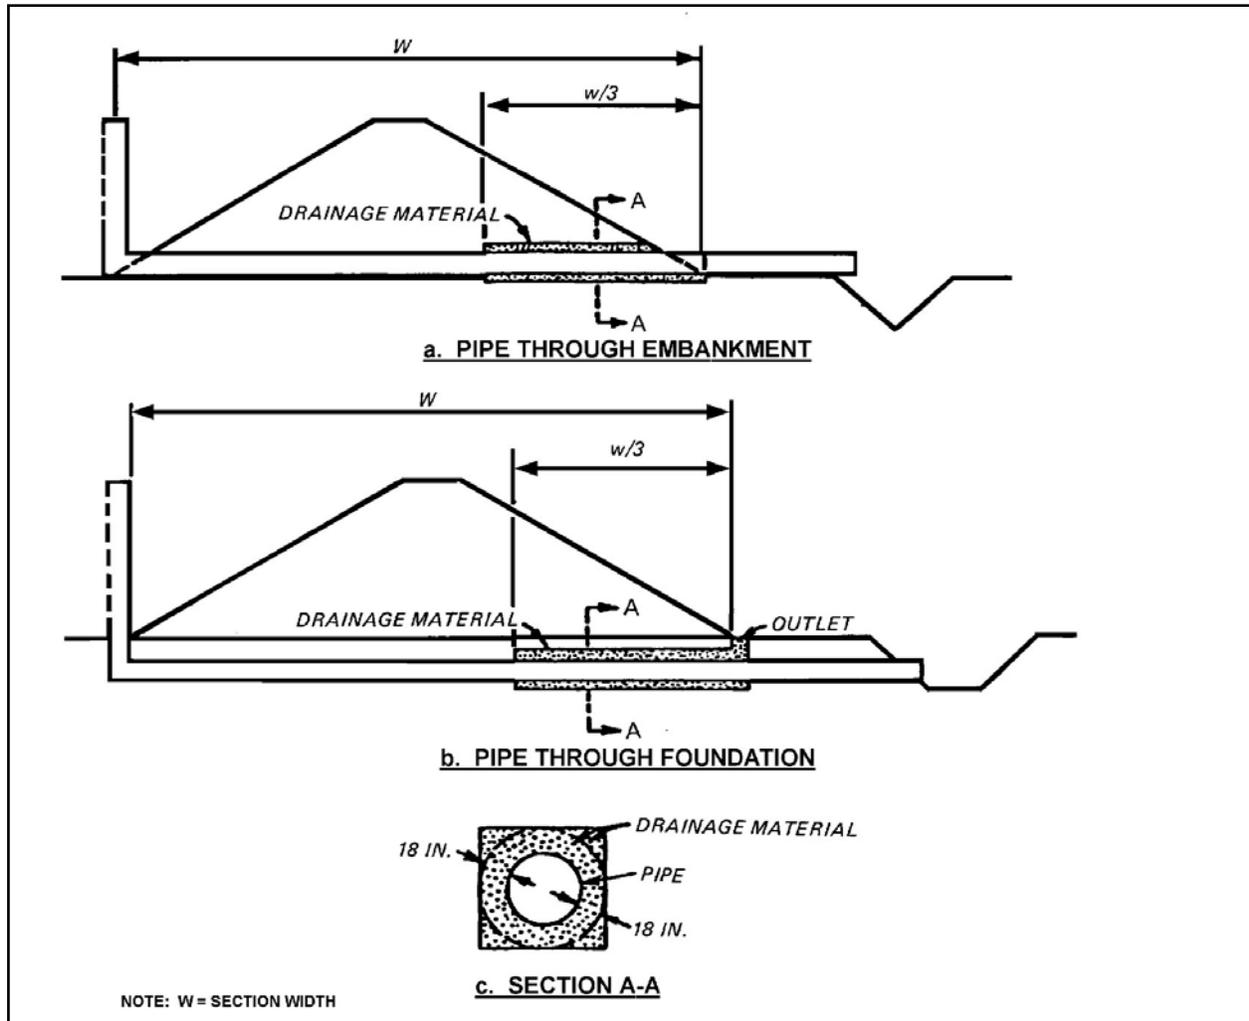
Annular Drainage Material Around the Outlet One-Third of a Pipe
